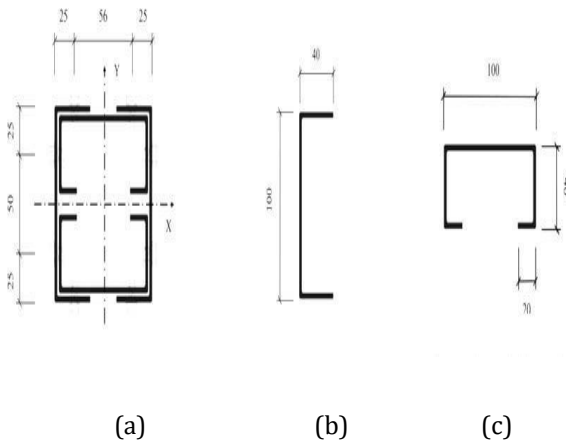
(a) built-up section (b) channel section (c) lipped channel section
